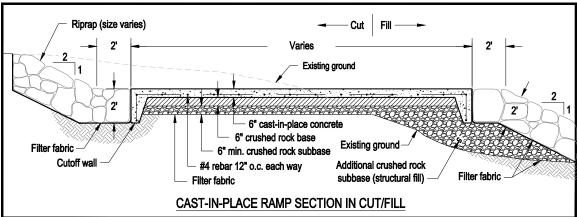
Cast-in-place ramp section in a cut and/or fill situation
